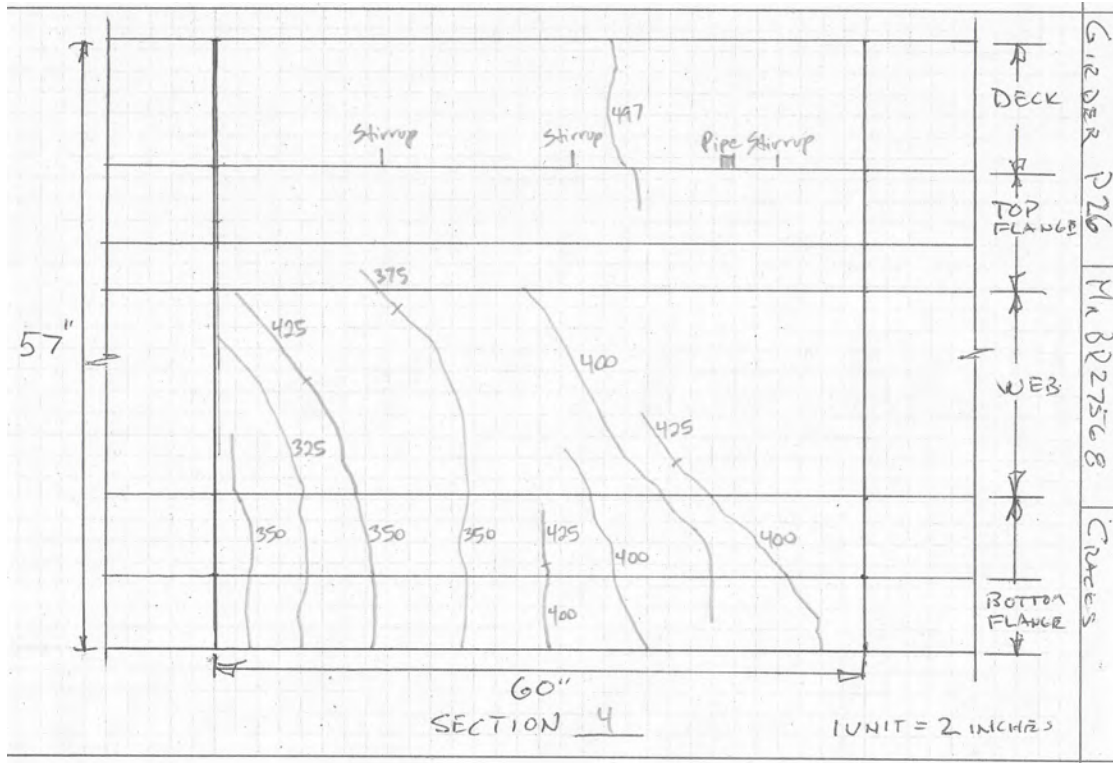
Girder P26 crack pattern – Section 4
